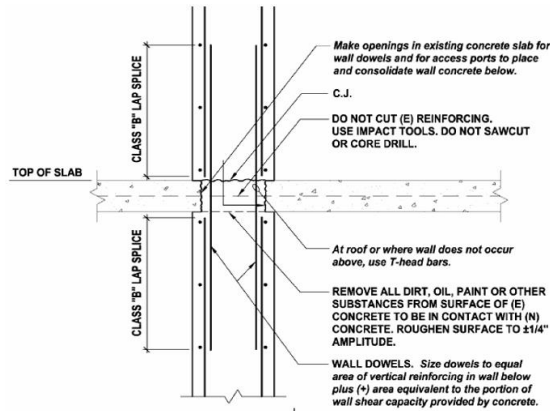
Concrete wall connection to concrete slab (FEMA 547, 2006)
